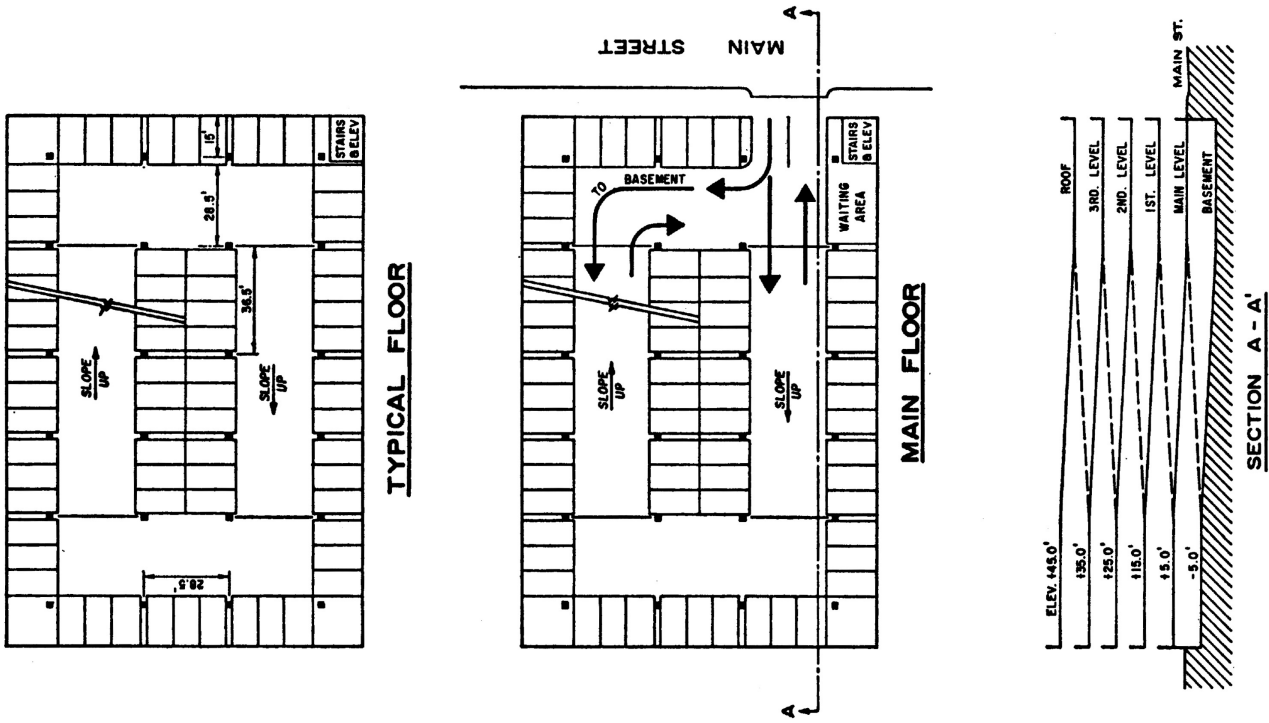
Functional Plan: Sloping Floor Garage.
